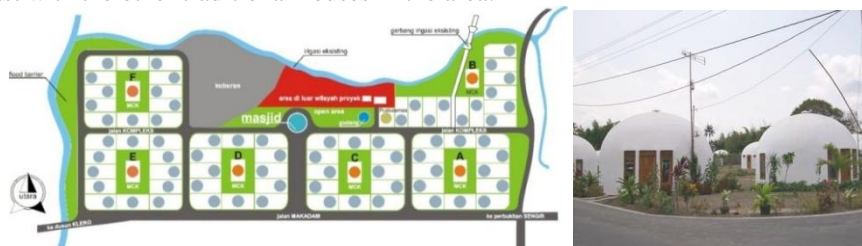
Siteplan and Form of Dome House in Nglepen village
